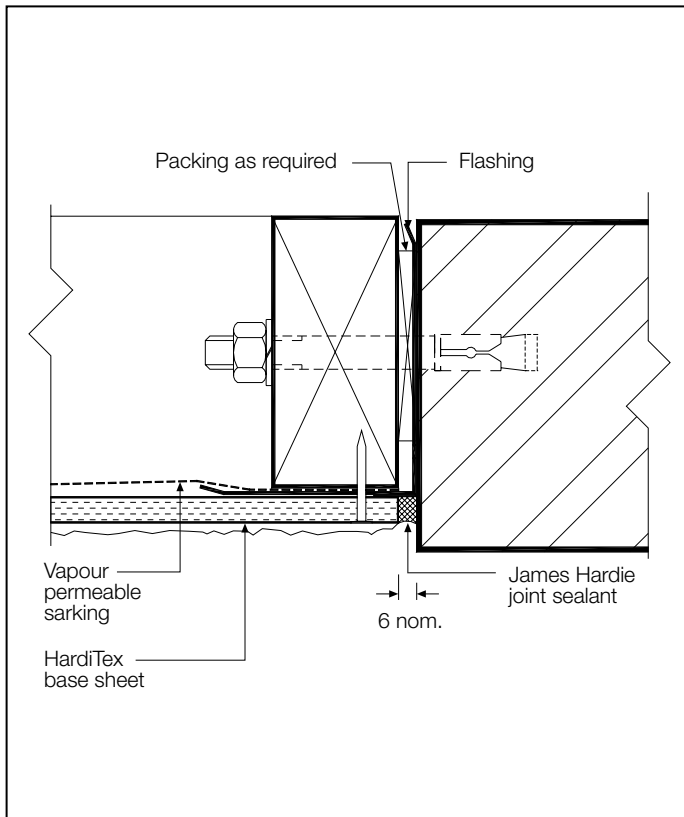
VERTICAL MOVEMENT JOINT - INTERSECTION WITH MASONRY STRUCTURE
